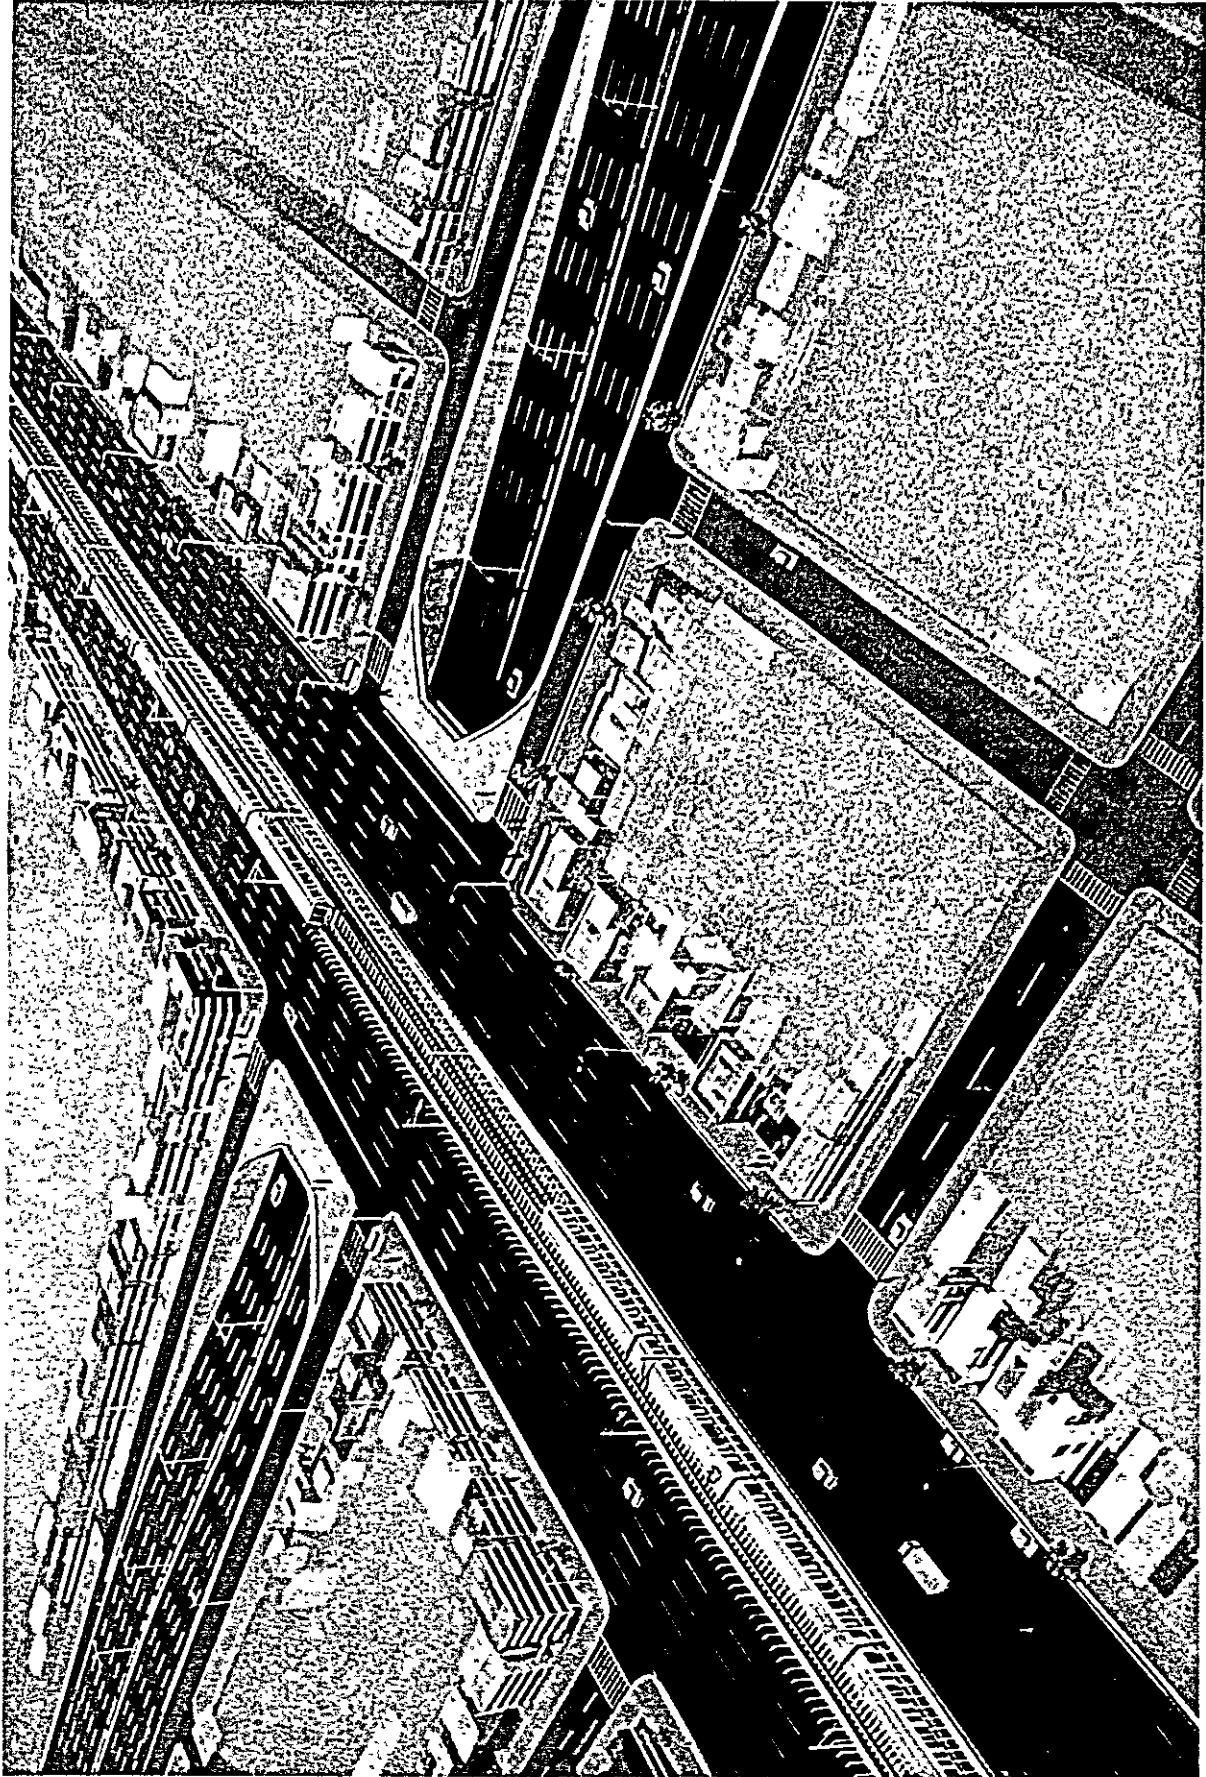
Grade Separated Crossing (Railway Crossing Under the Ground) Unit: mm
